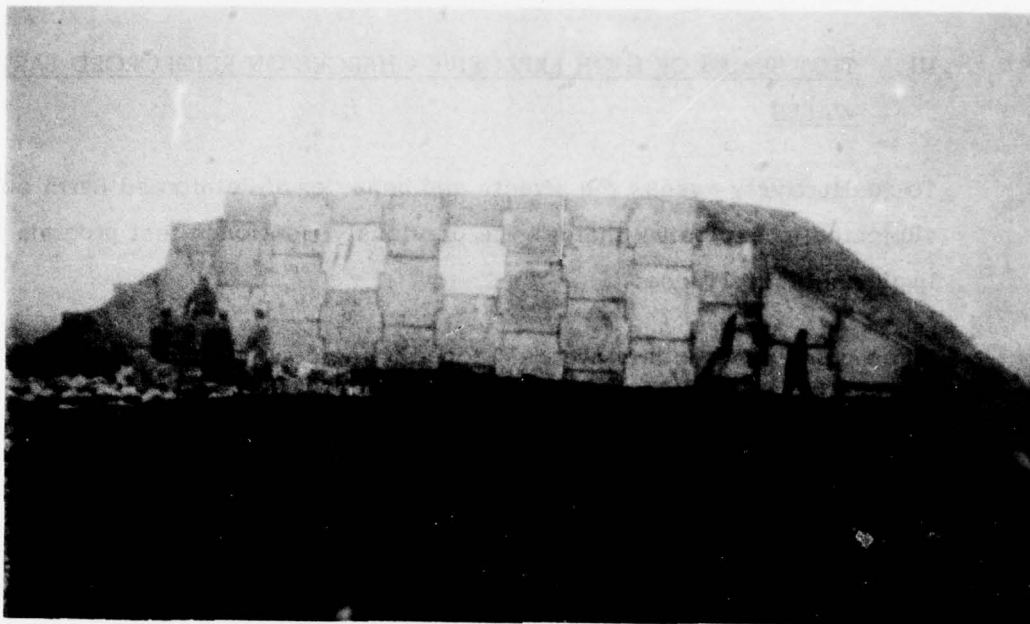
Single Faced Concrete Clad Structure Prior to Testing
